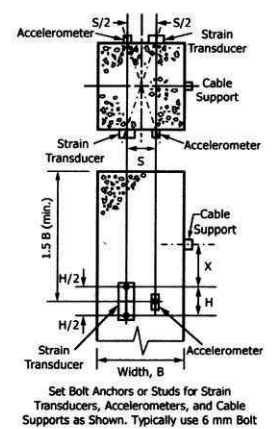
Typical Arrangement for Attaching Transducers to Concrete Piles
